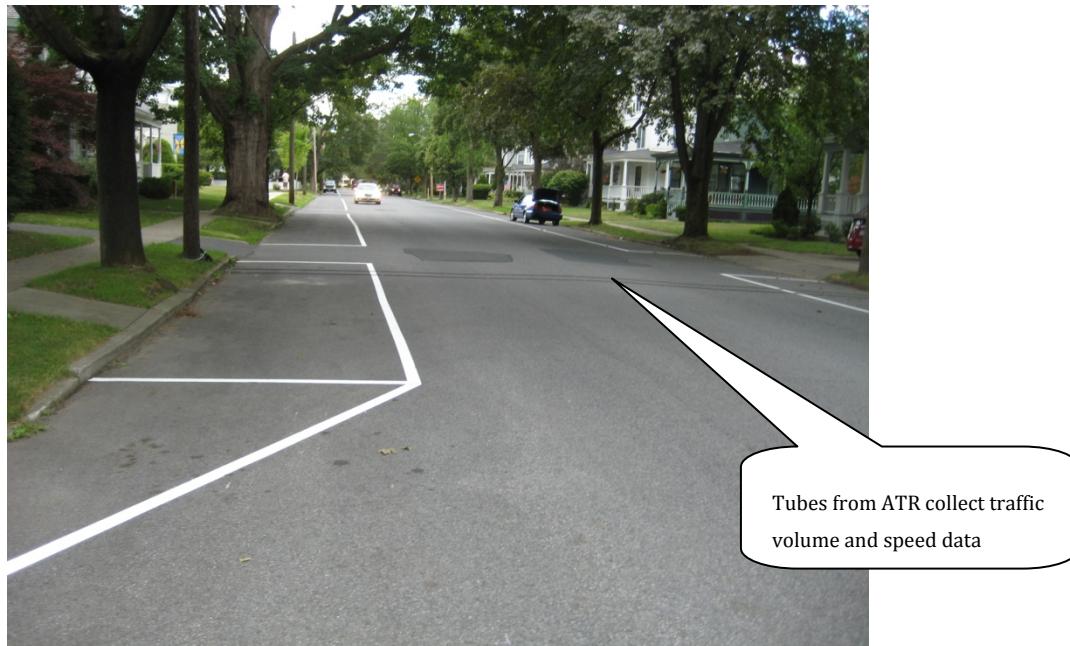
Temporary Striping Plan: Stop Bars and Parking at the Crandall Street Intersection
